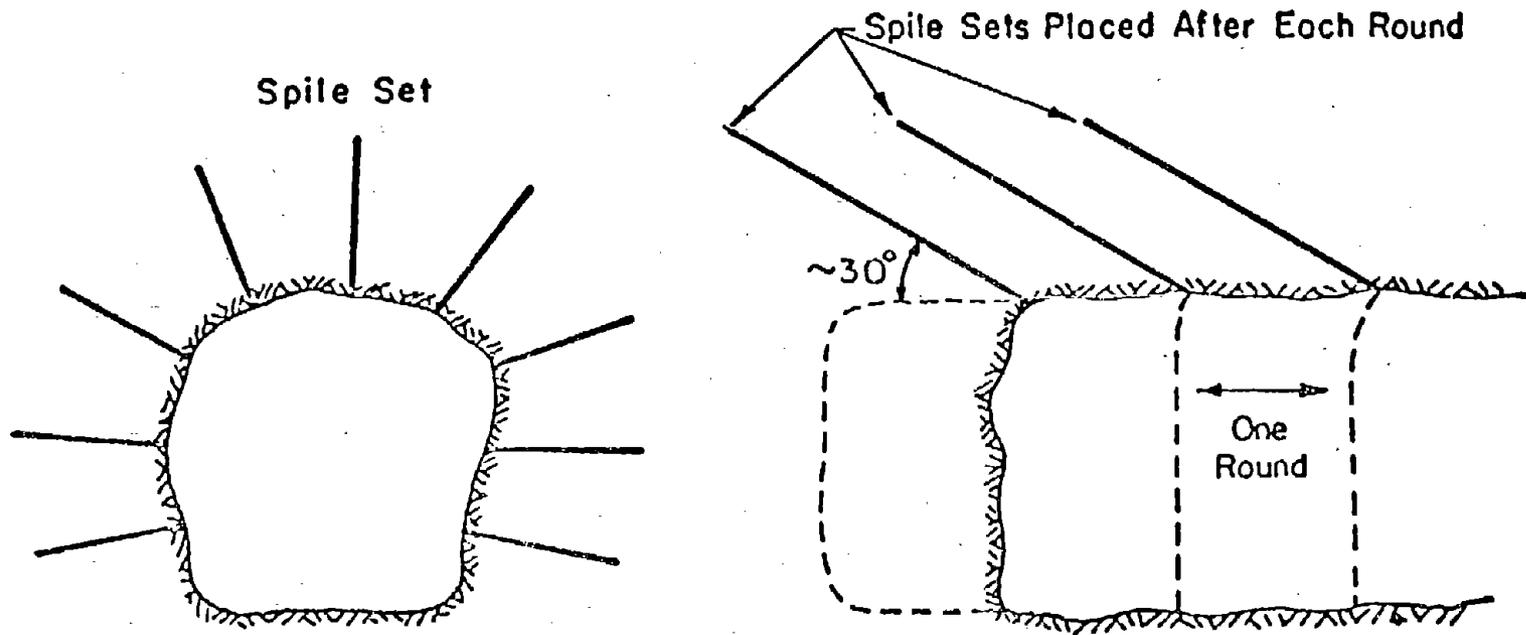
Spiling Reinforcement Ahead of the Face (a form of pre-reinforcement) [3.71]
